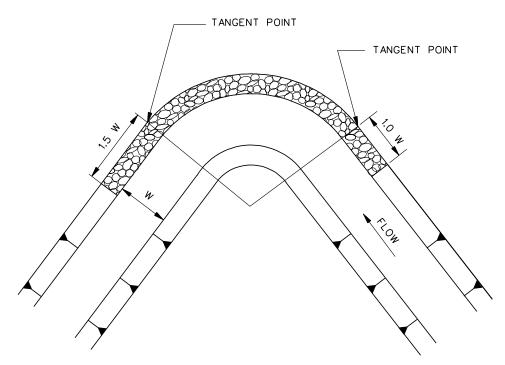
Longitudinal Extent of Revetment Protection
